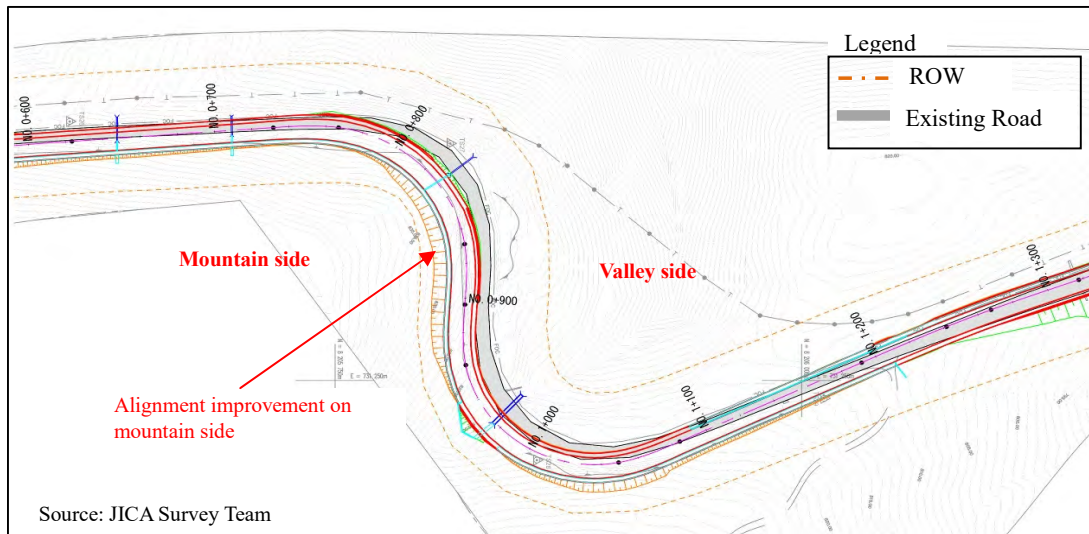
Example of alignment improvement 307.1~307.8 (Design speed =40 km/hr section)
